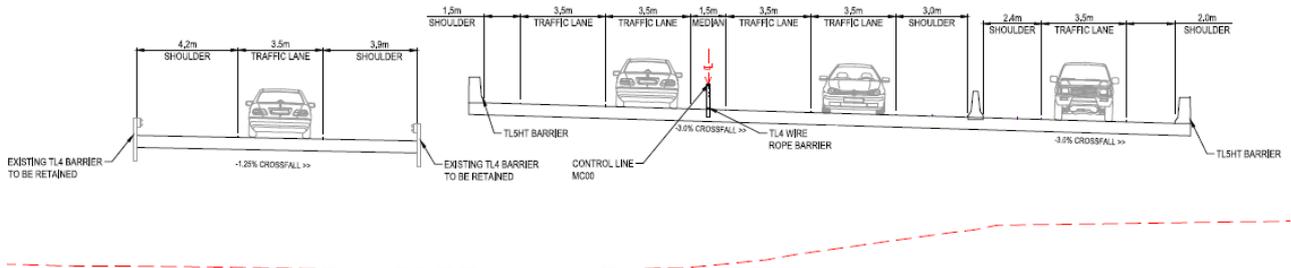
Typical Cross Section Mainline – Cam River Bridge (30% Detailed Design, July 2025)
